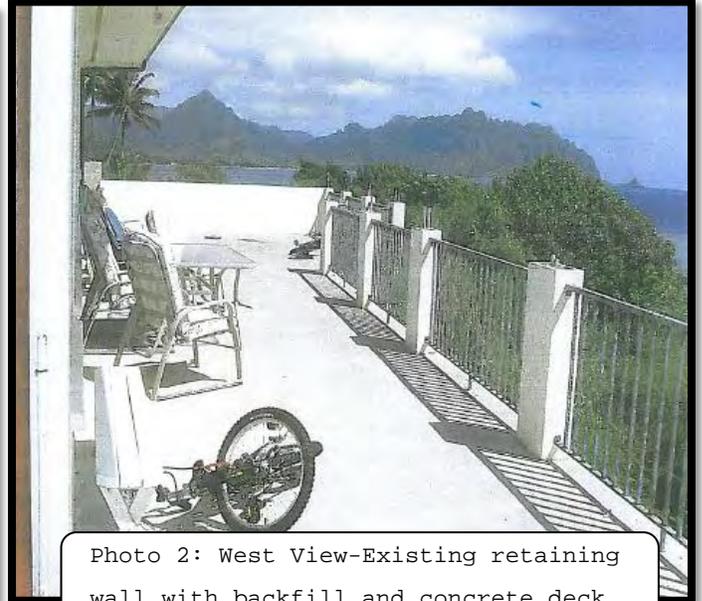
West View-Existing retaining wall with backfill and concrete deck.
